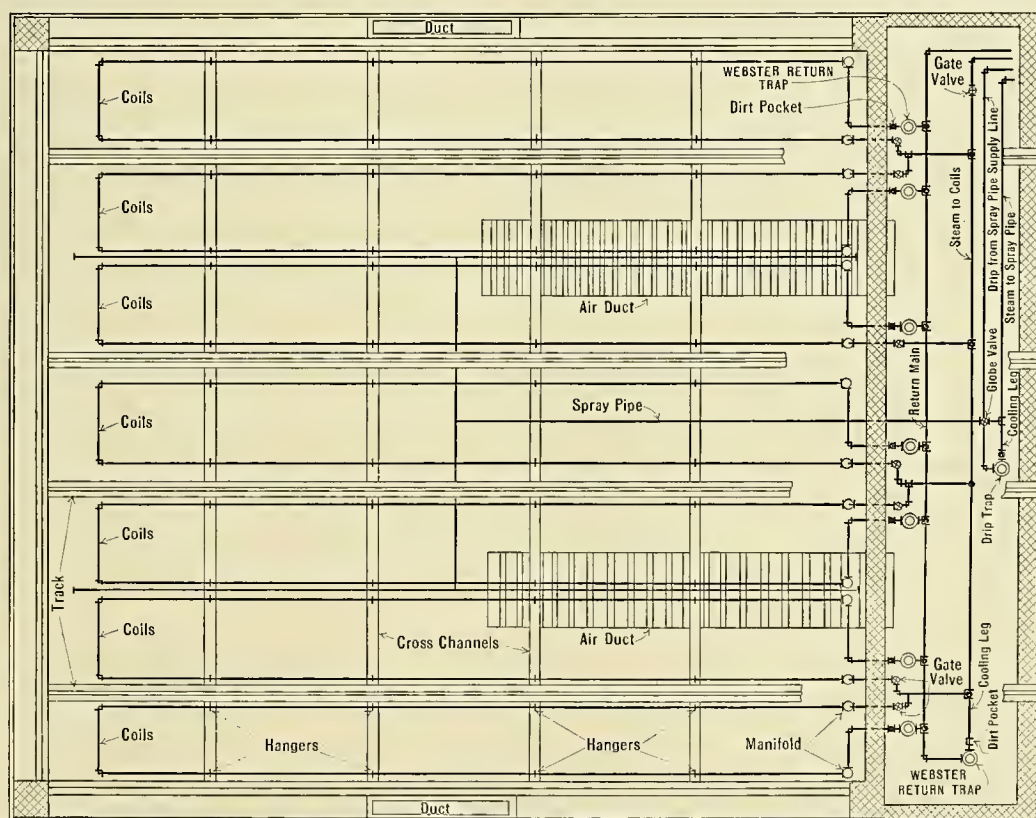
Sectional drawings of a typical small dry kiln using individual return traps for drainage of coils
